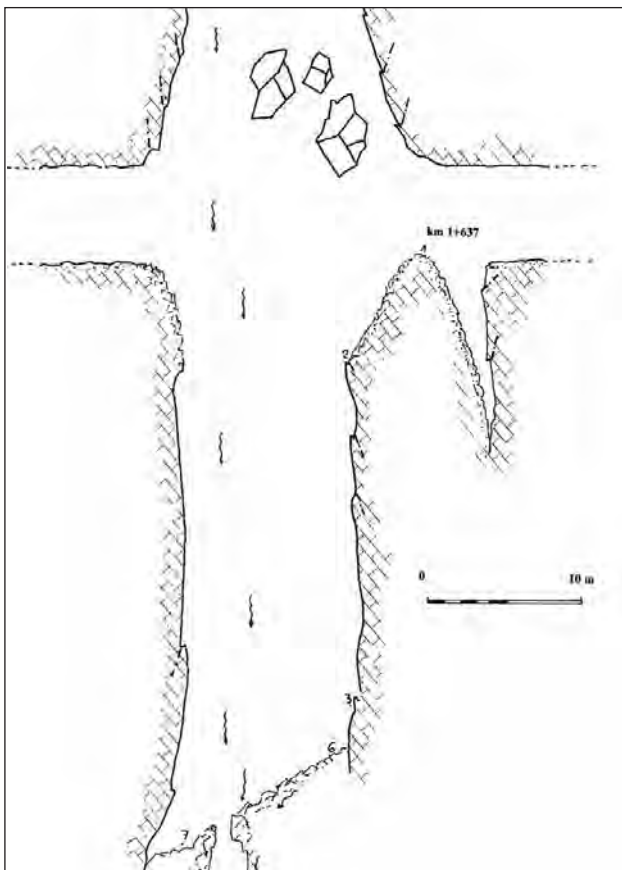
Cave profile and plan of cavern at km 1+637 in Biokovo tunnel.
